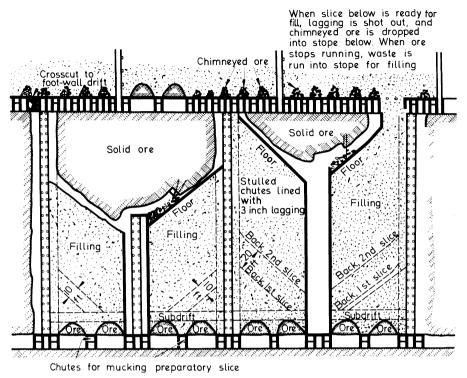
Details of inclined cut-and-fill stoping, Eighty-Five Mine, New Mexico.⁽⁸⁾
